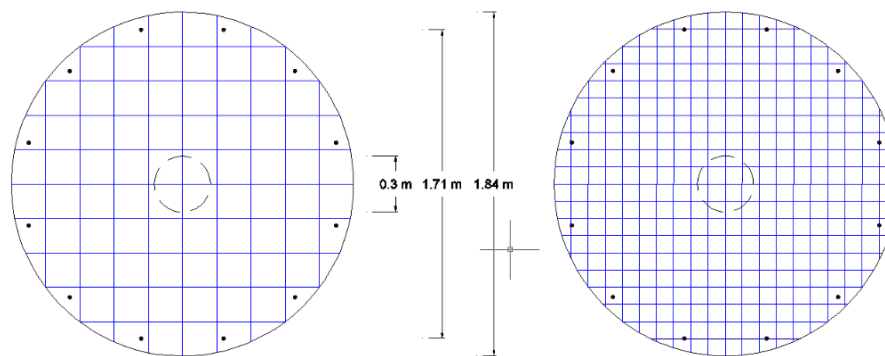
Geometry and reinforcement layout in isolated slab specimens
